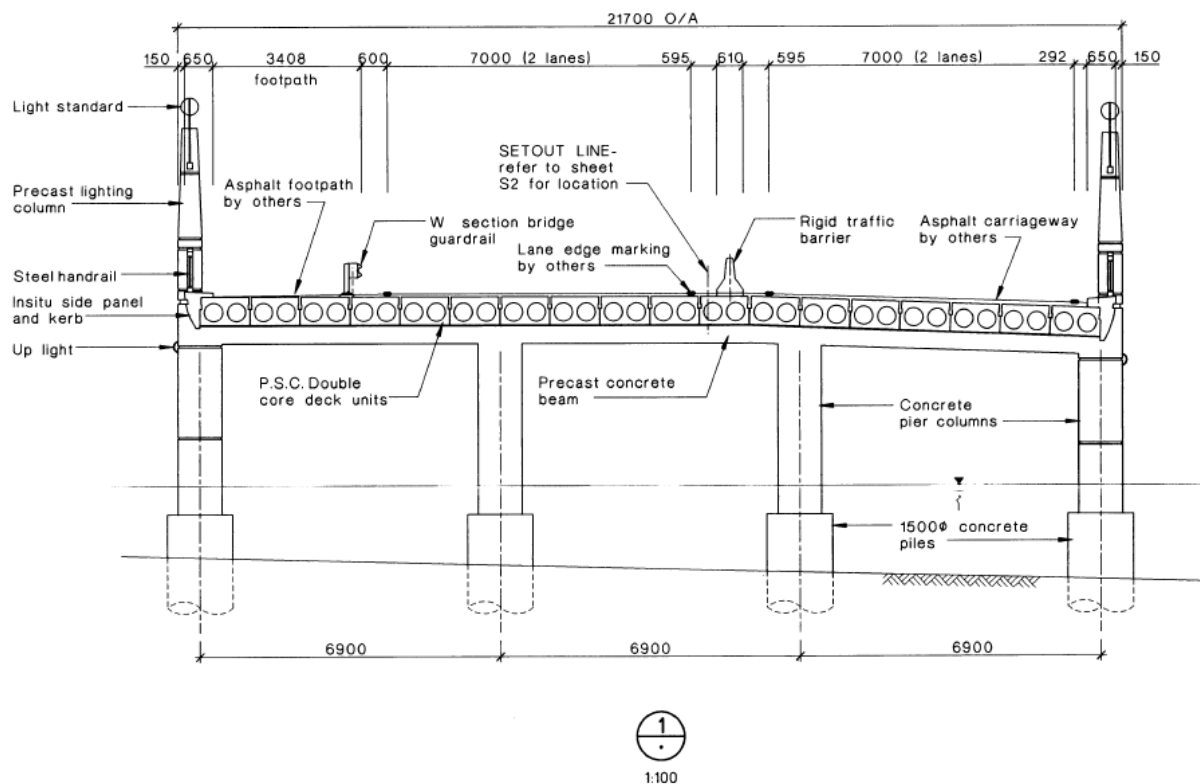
ANZAC Bridge transverse section, Christchurch City Council design drawing
